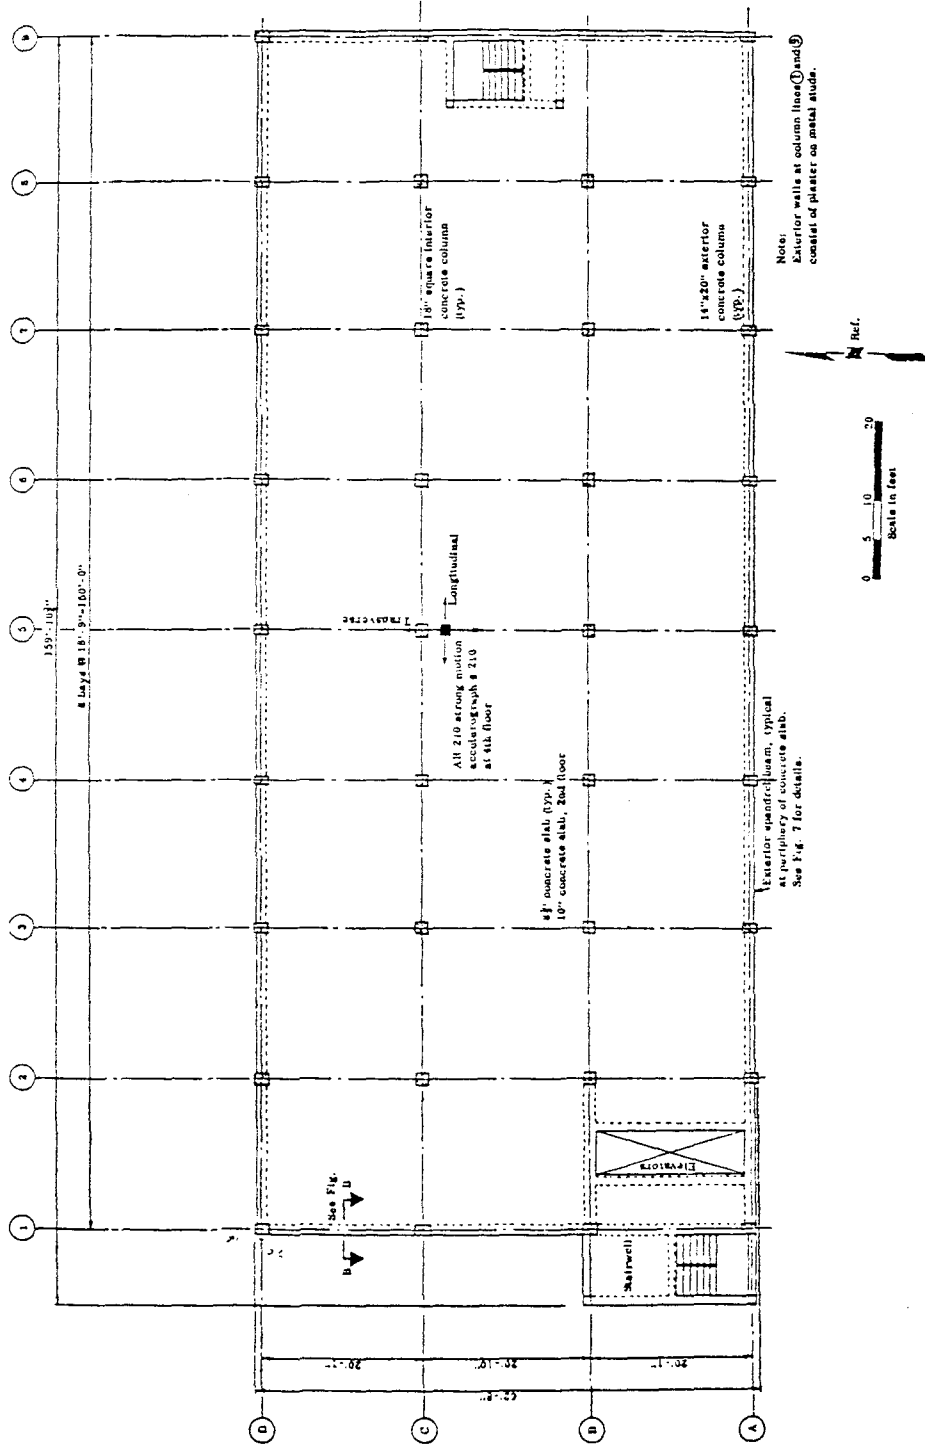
HOLIDAY INN, ORION AVENUE. TYPICAL FLOOR FRAMING PLAN.
